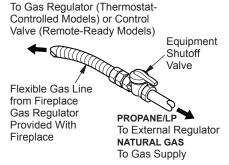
Attaching Flexible Gas Line to Equipment Shutoff Valve
